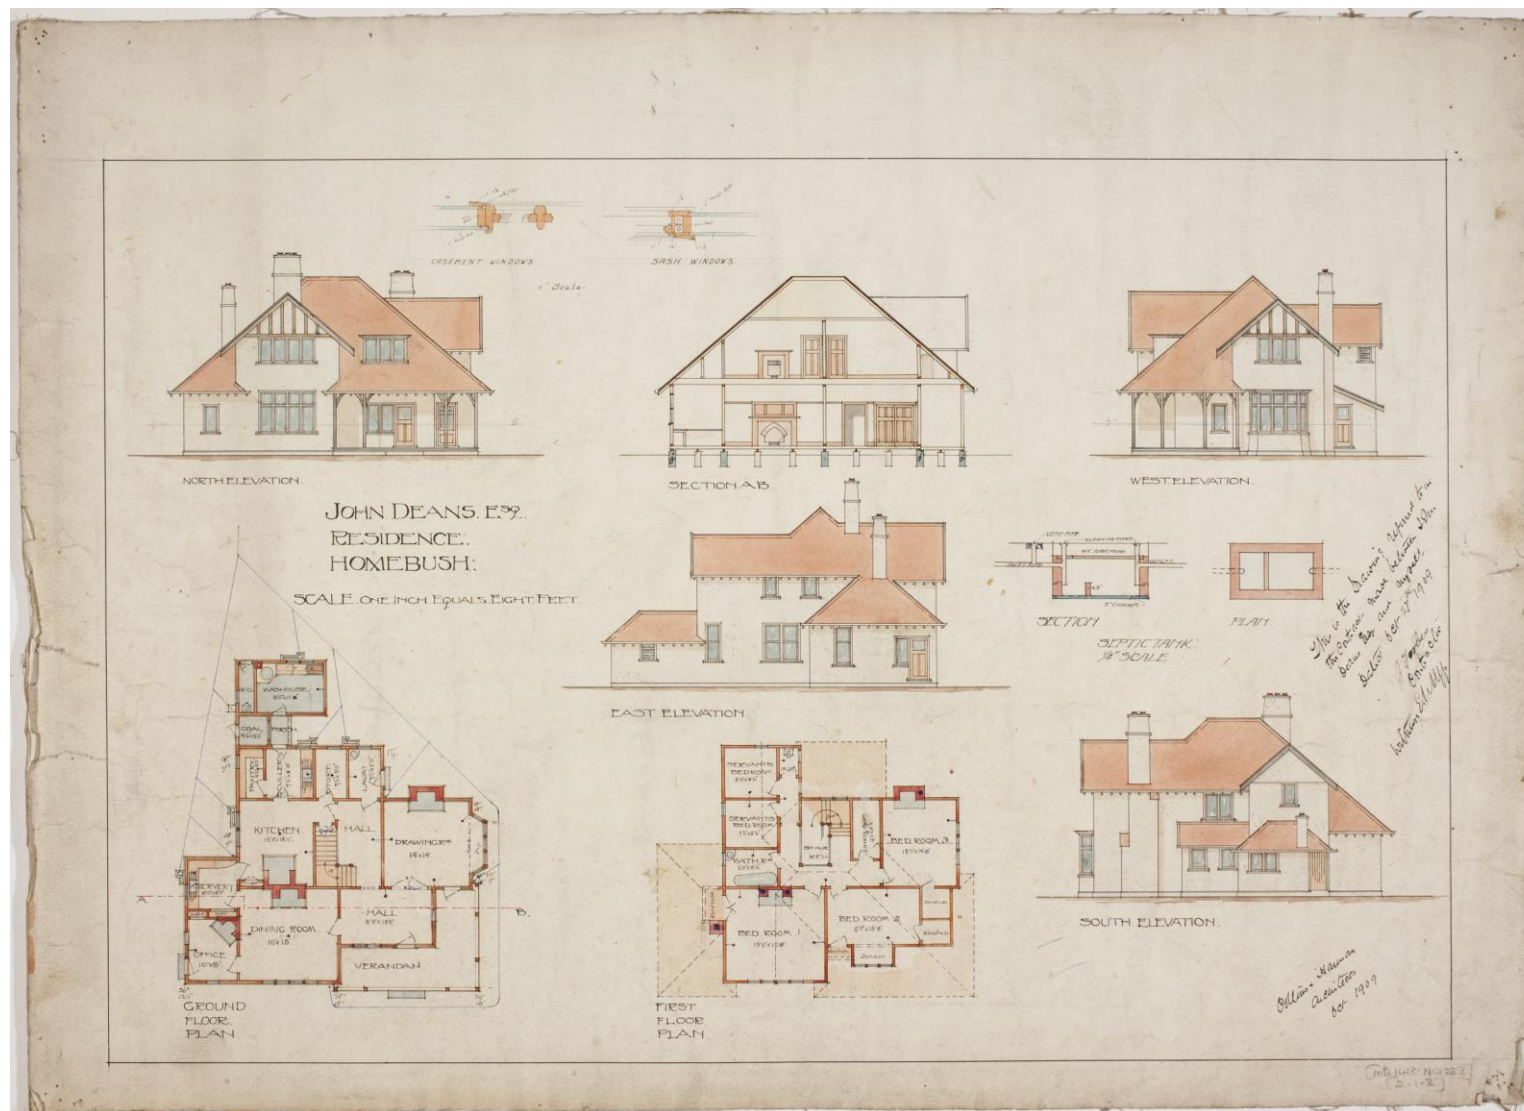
Collins and Harman, John Deans, Esq., Residence at Homebush, Kirkstyle, plans, elevations and sections (1909).
